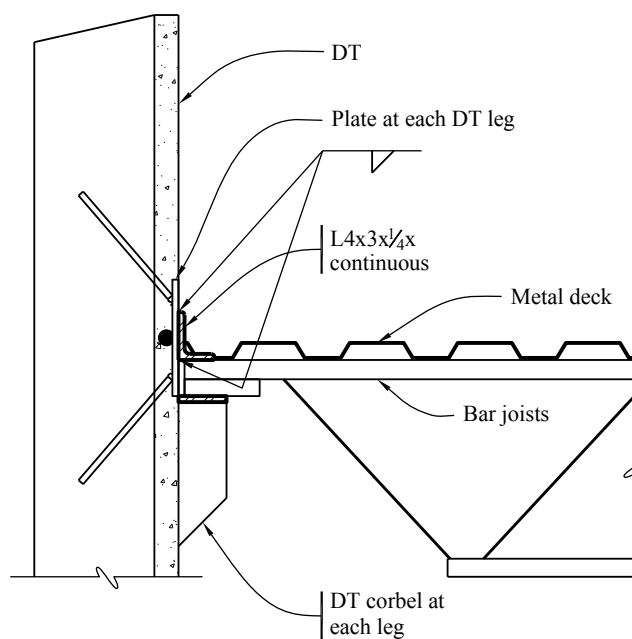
Sketch of connection of load-bearing DT wall panel at the roof
